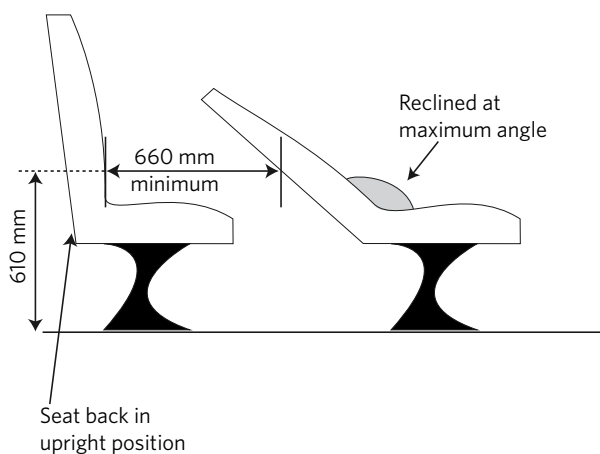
Reclinable seat spacing measurement (660 mm)
